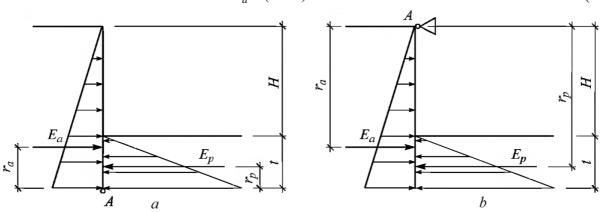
Calculation scheme for determining r_a and r_p for the cantilevered (a) and braced (b) walls
